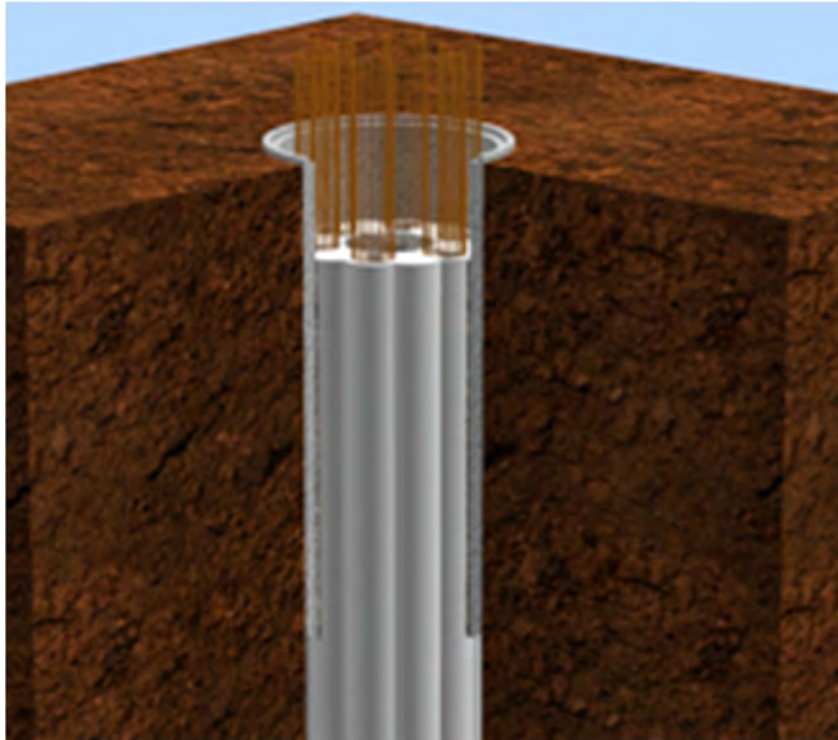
Foundation structure - detail of the top of the element at the end of stage 4
